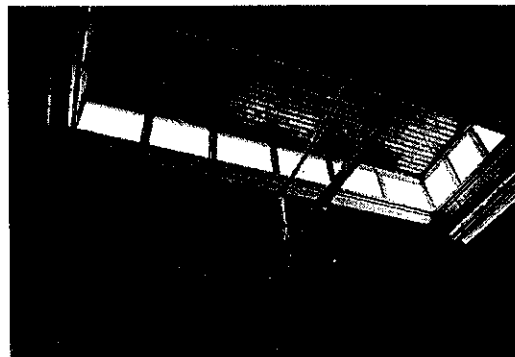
Interior, Call Room (space CR01). Detail of lantern light and Queen Post trusses.
